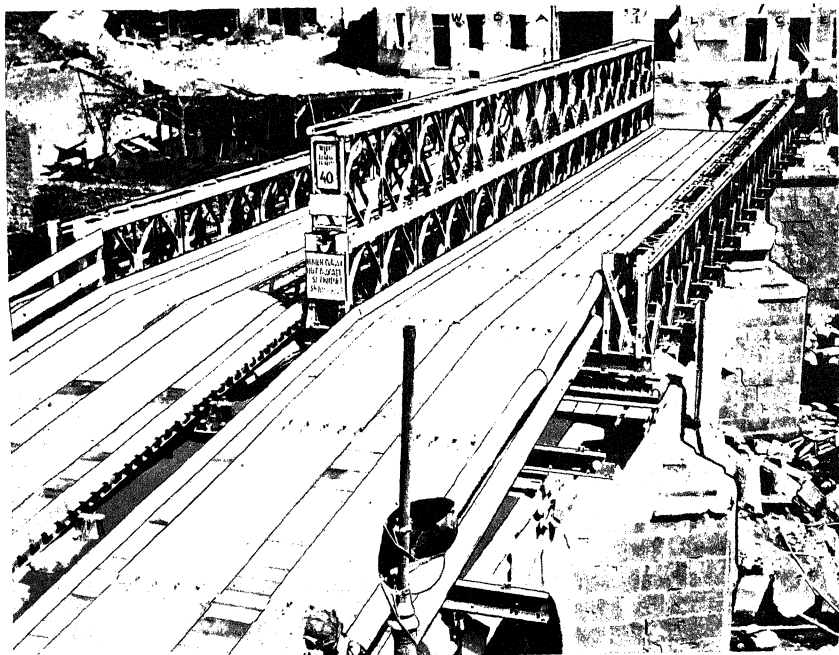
Two-lane panel bridge over demolished masonry arch bridge.
